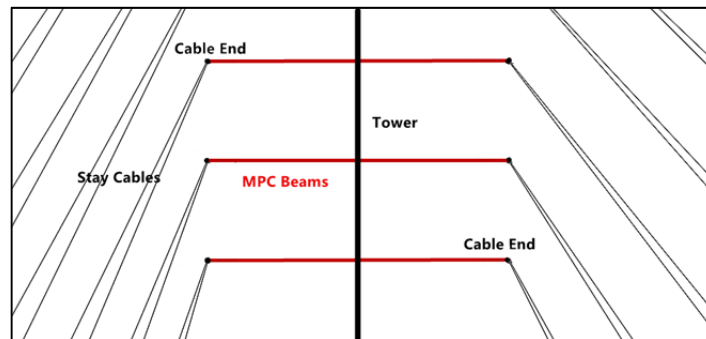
MPC (Multiple Point Constraints) beam between cables and tower.
